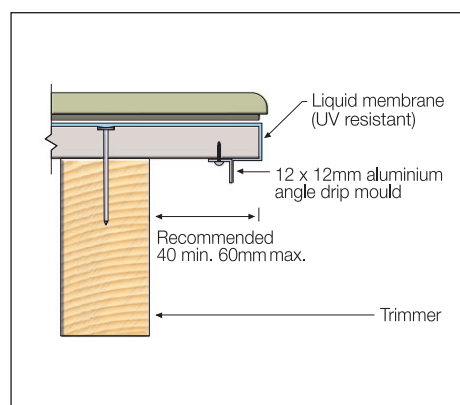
METHOD 1 DECK EDGE DETAIL USING DRIP ANGLE
